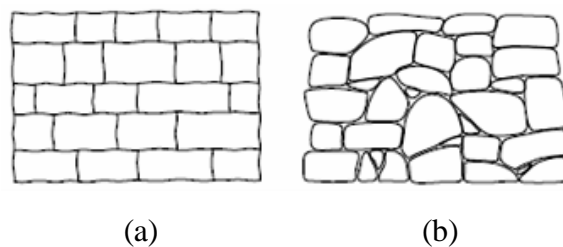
Examples of Types Stone Masonry Walls (Lourenço, 1998); (a) Ashlar Masonry, (b) Rubble Masonry
